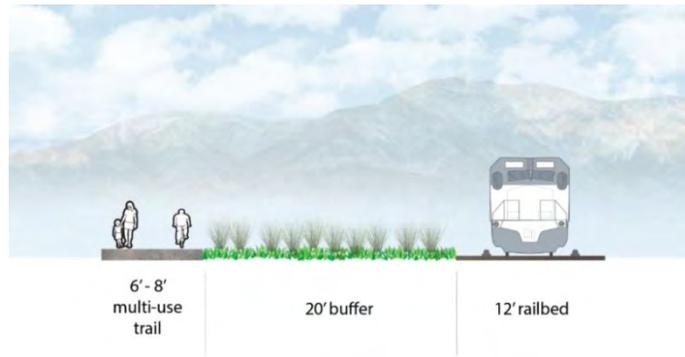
Off-Highway Trail (Rails-to-Trail) Concept Typical Section
